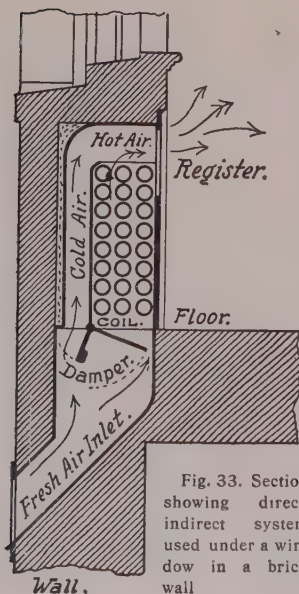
Section showing direct indirect system used under a window in a brick wall
